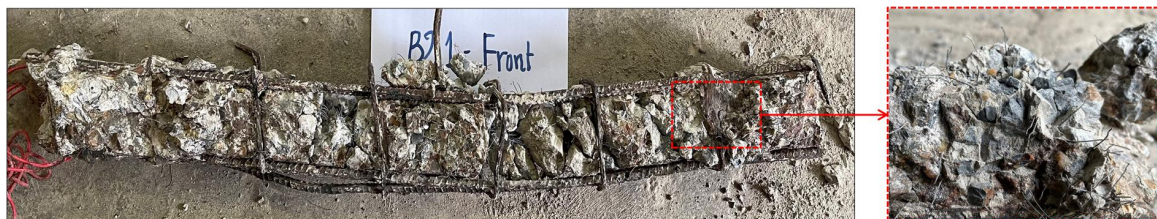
Stage of a corroded SFRC beam when extracting rebars
